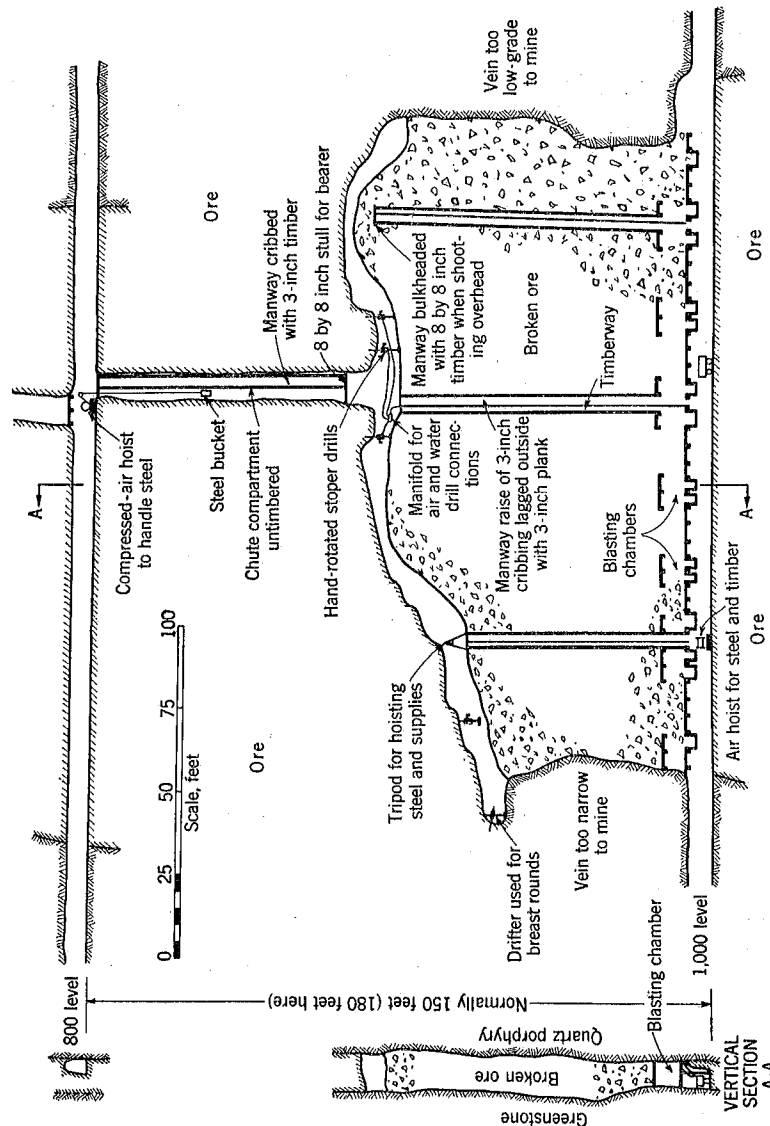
Longitudinal section through slope, Verde Central mine.
